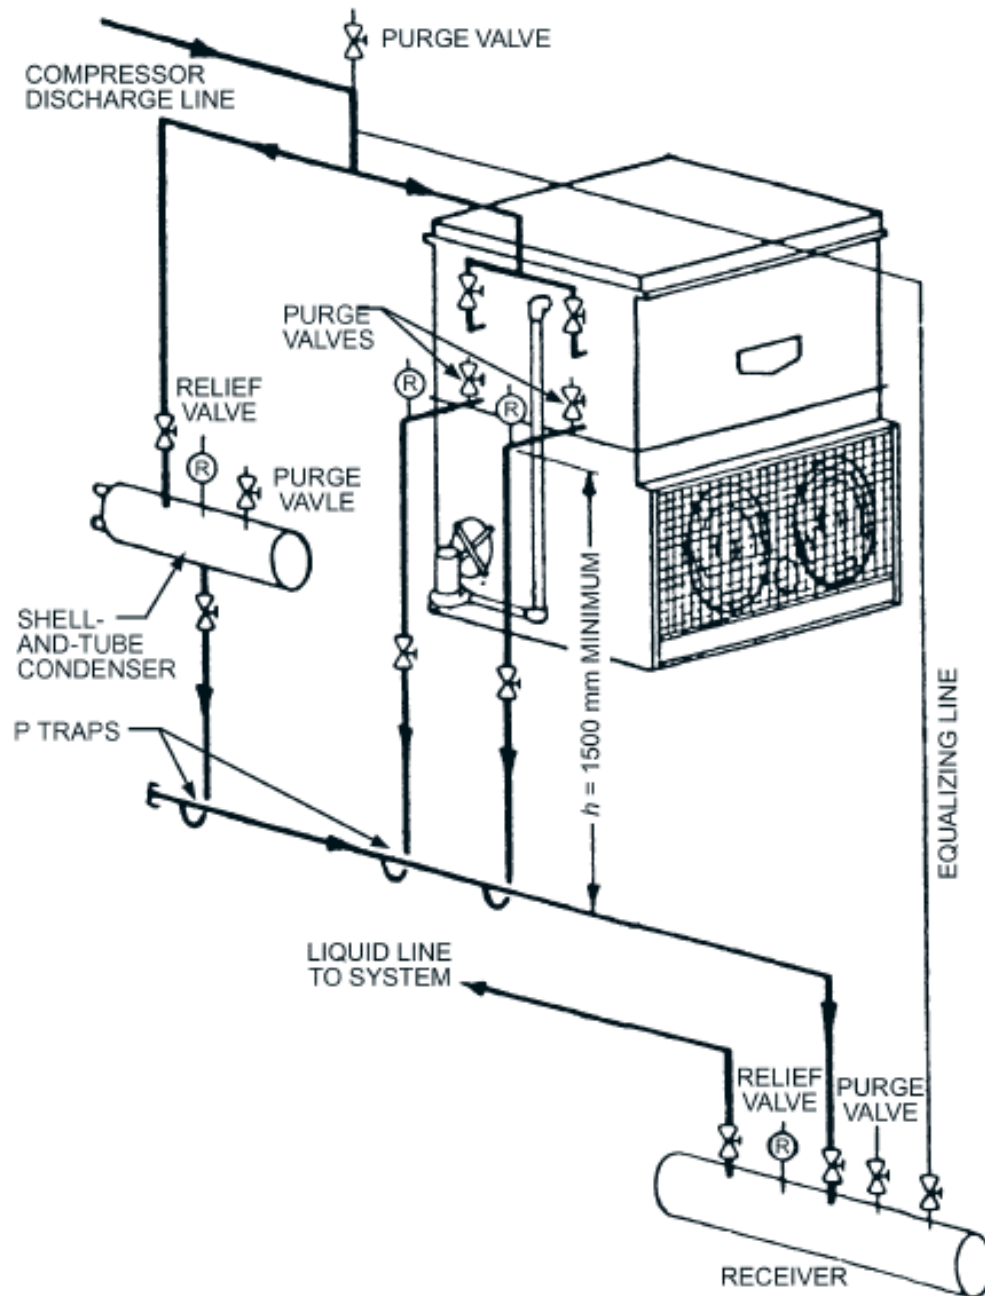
Piping for Shell-and-Tube and Evaporative Condensers with Top Inlet Receiver
